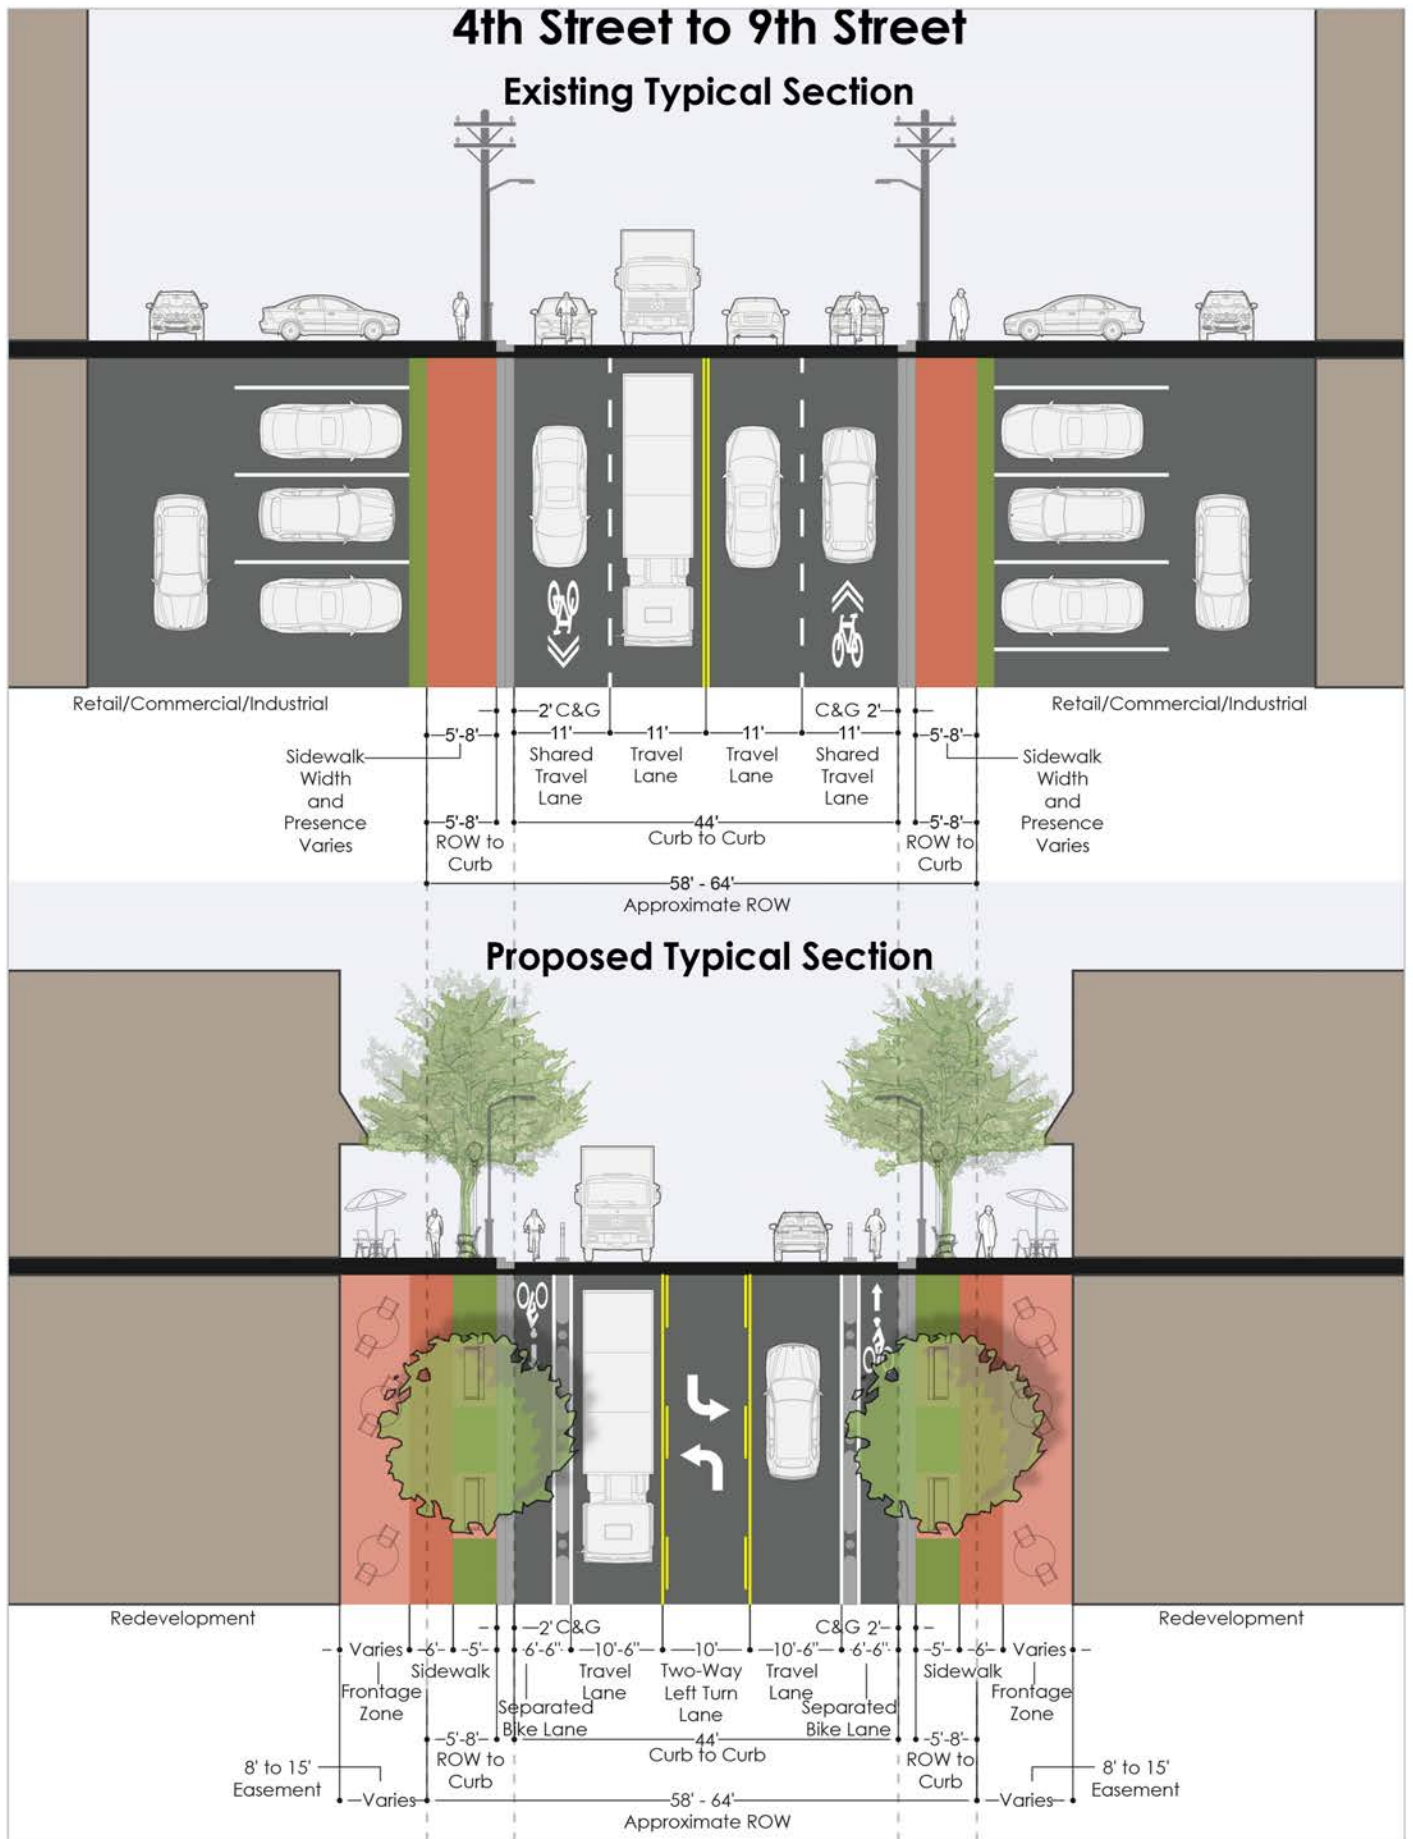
Existing and Proposed Typical Section - 4th Street to 9th Street
